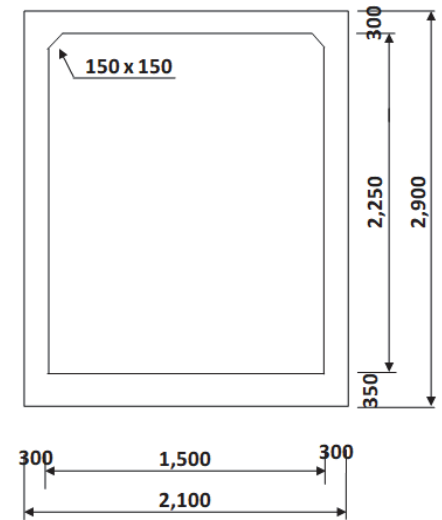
Sectional dimension of a power cable tunnel specimen 2.
